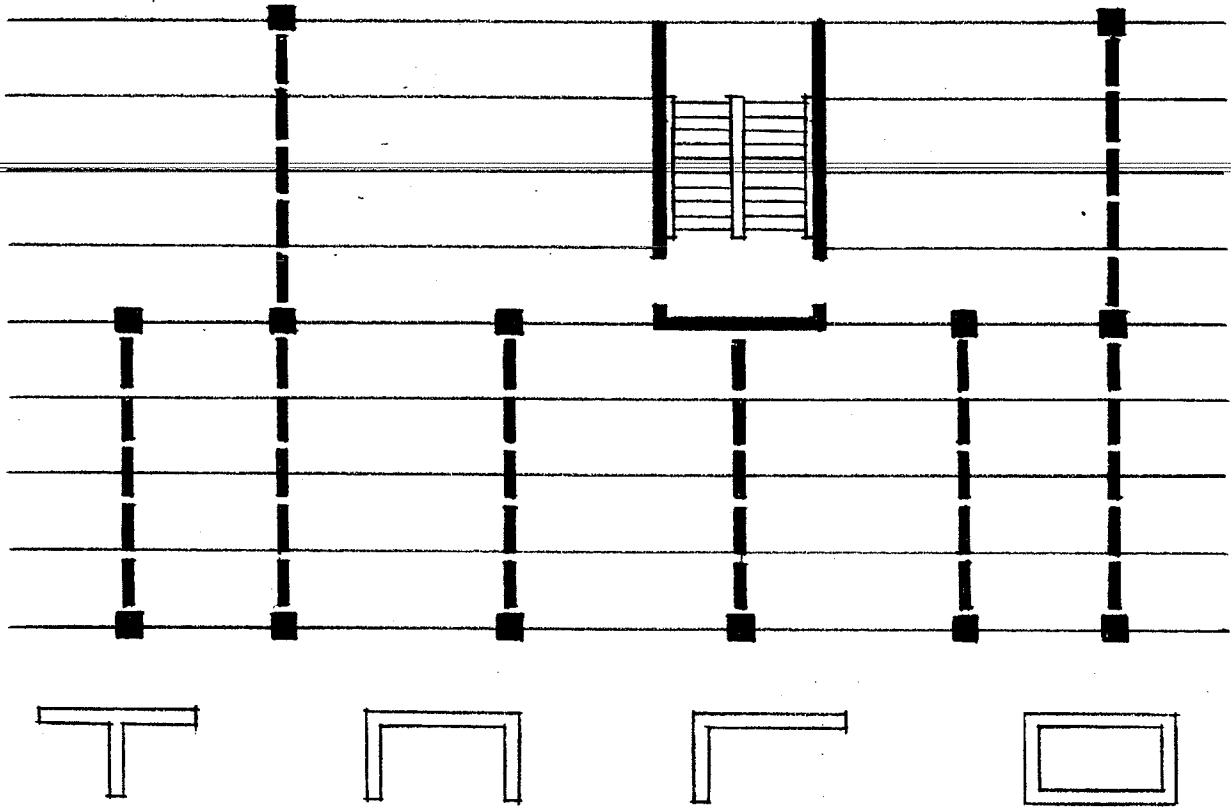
COLUMN-BEAM-SLAB SYSTEM, with simply supported slabs. Frames of T-, L-, U-, or O-form can be utilized instead of columns and beams.
